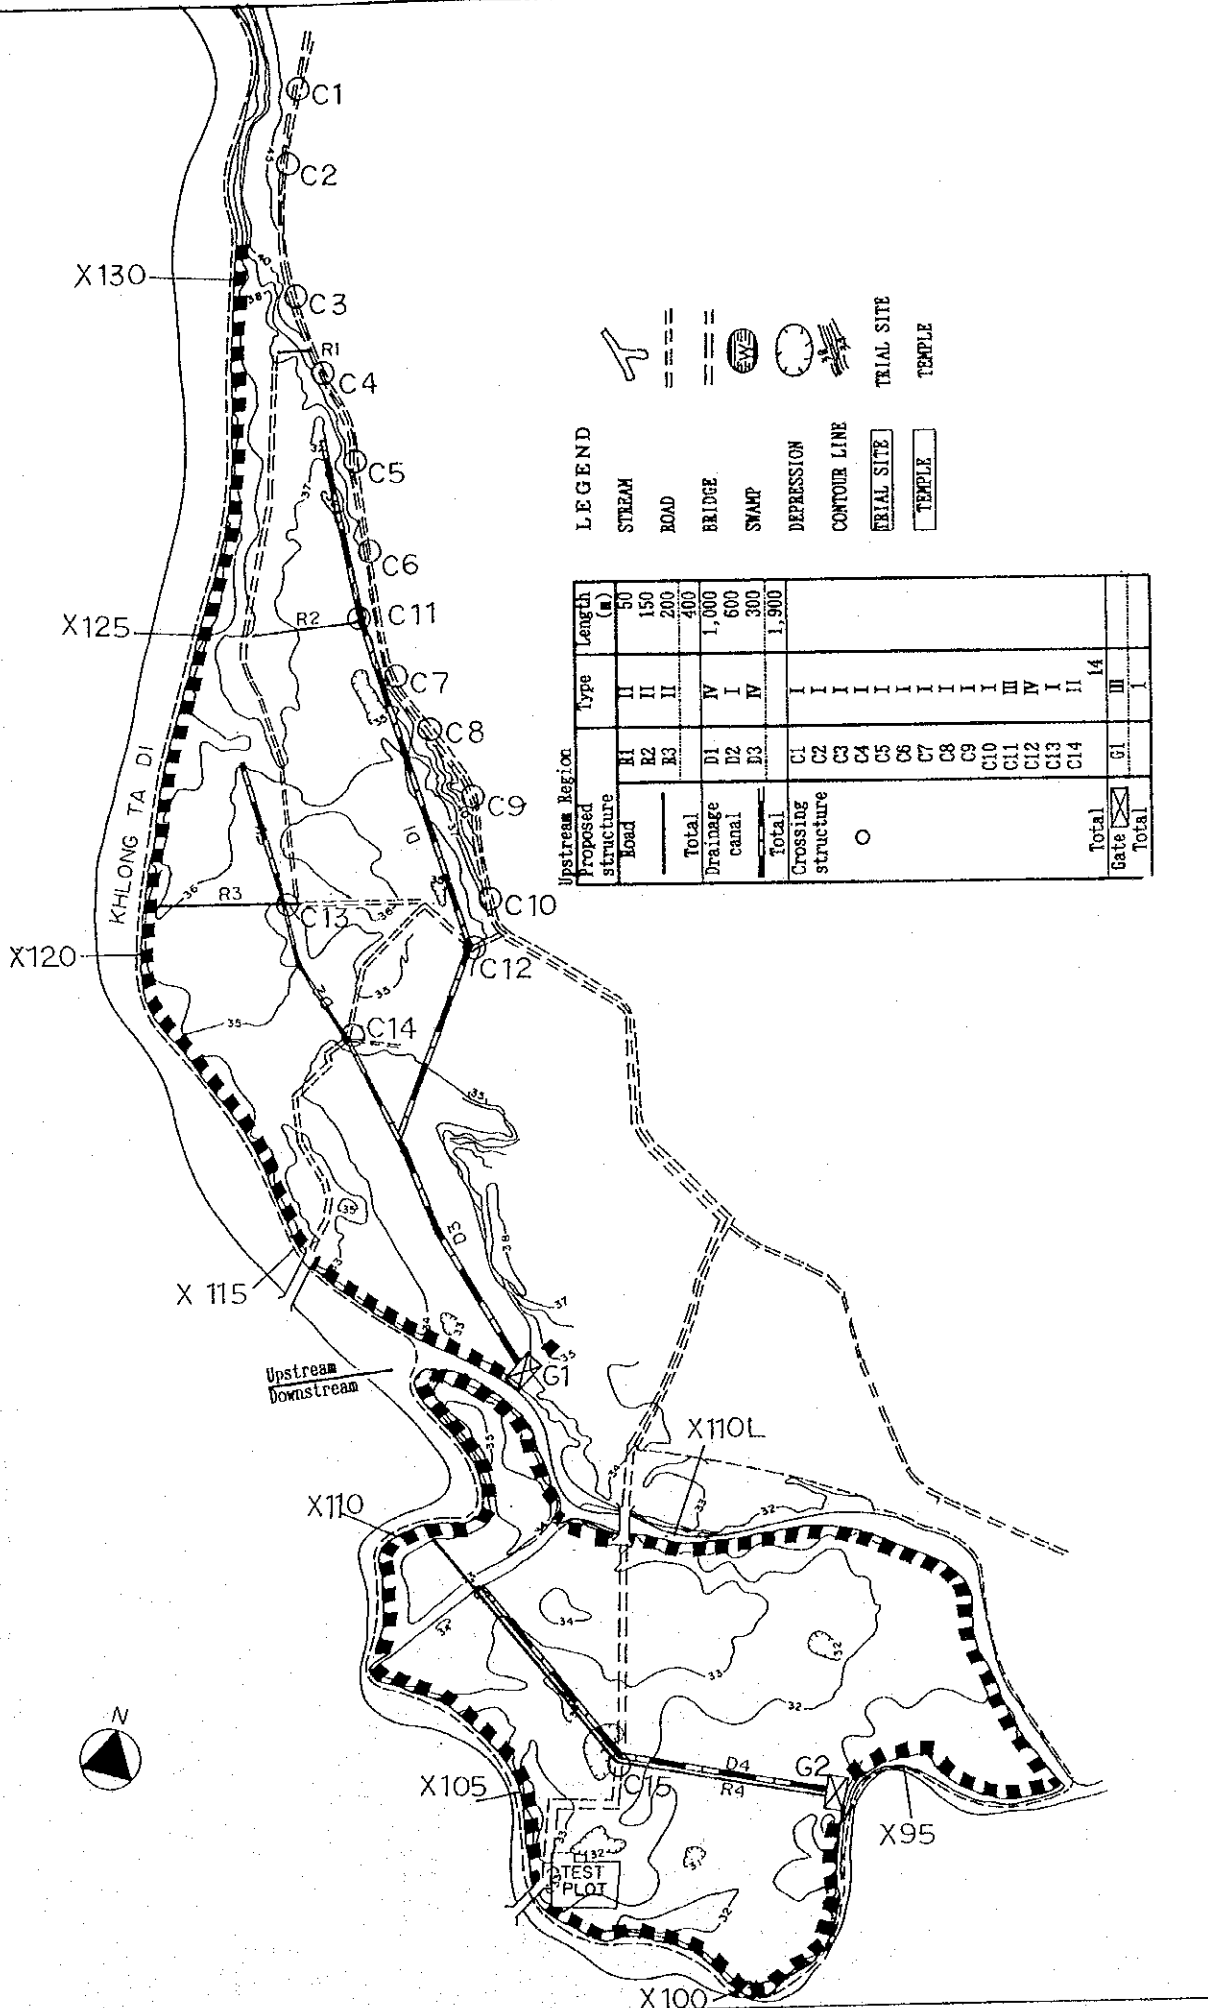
Land Use Plan in Lan Saka (Case-3)
